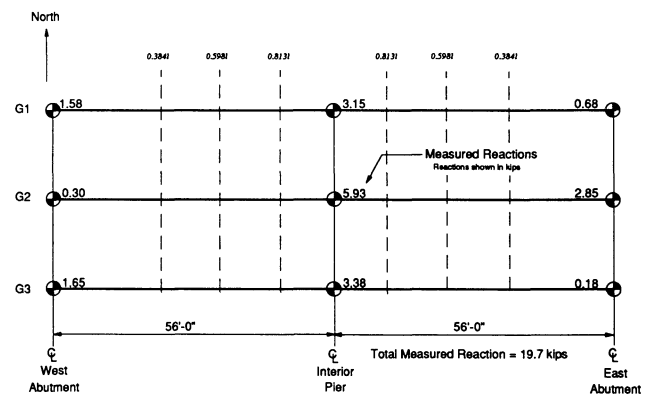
Measured reactions after erection of steel girders and cross frames.
